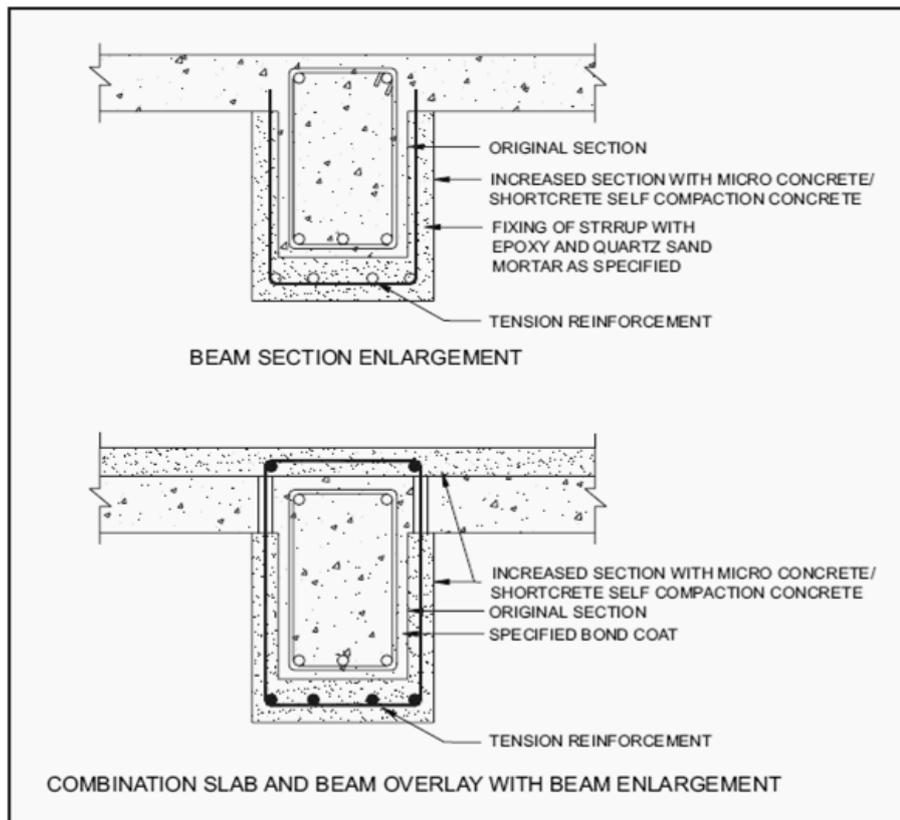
Beam Strengthening : Concrete Overlay And Section Enlargement
